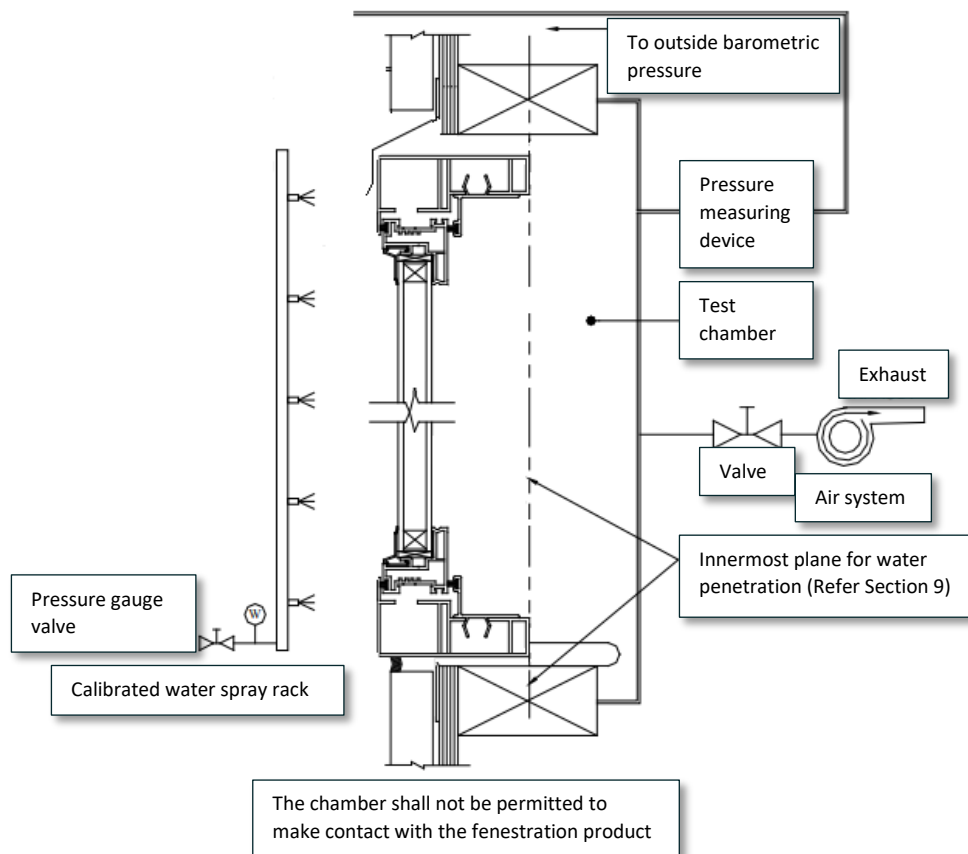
Typical Vacuum Chamber and Spray Rack Arrangement
